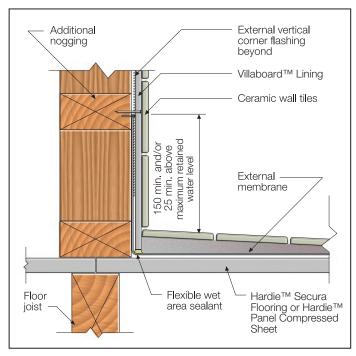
EXTERNAL MEMBRANE - VILLABOARD™ LINING
